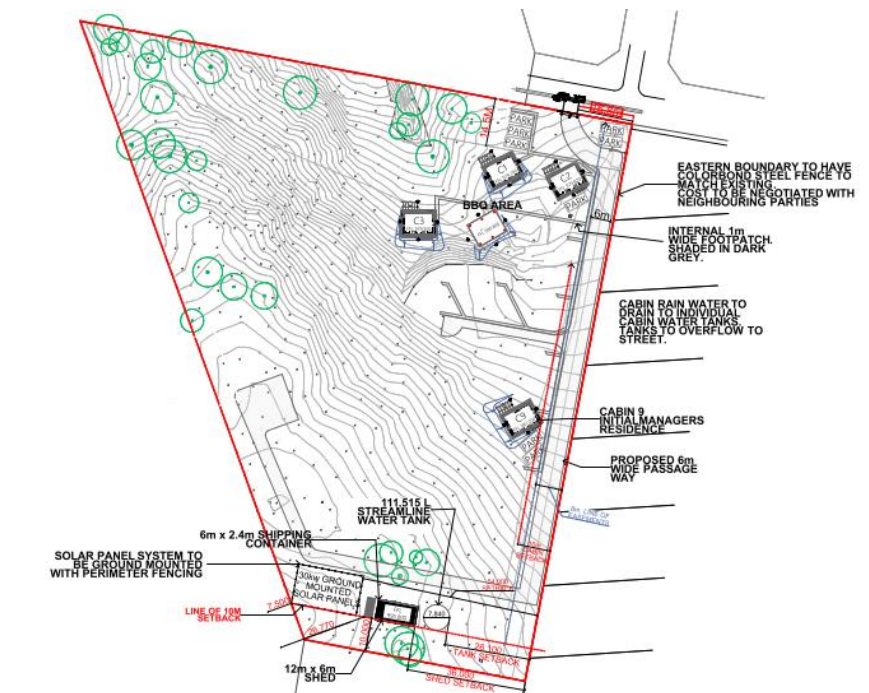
Proposed Site layout – Stage 2 Cabins 2 & 3 and the communal BBQ area
